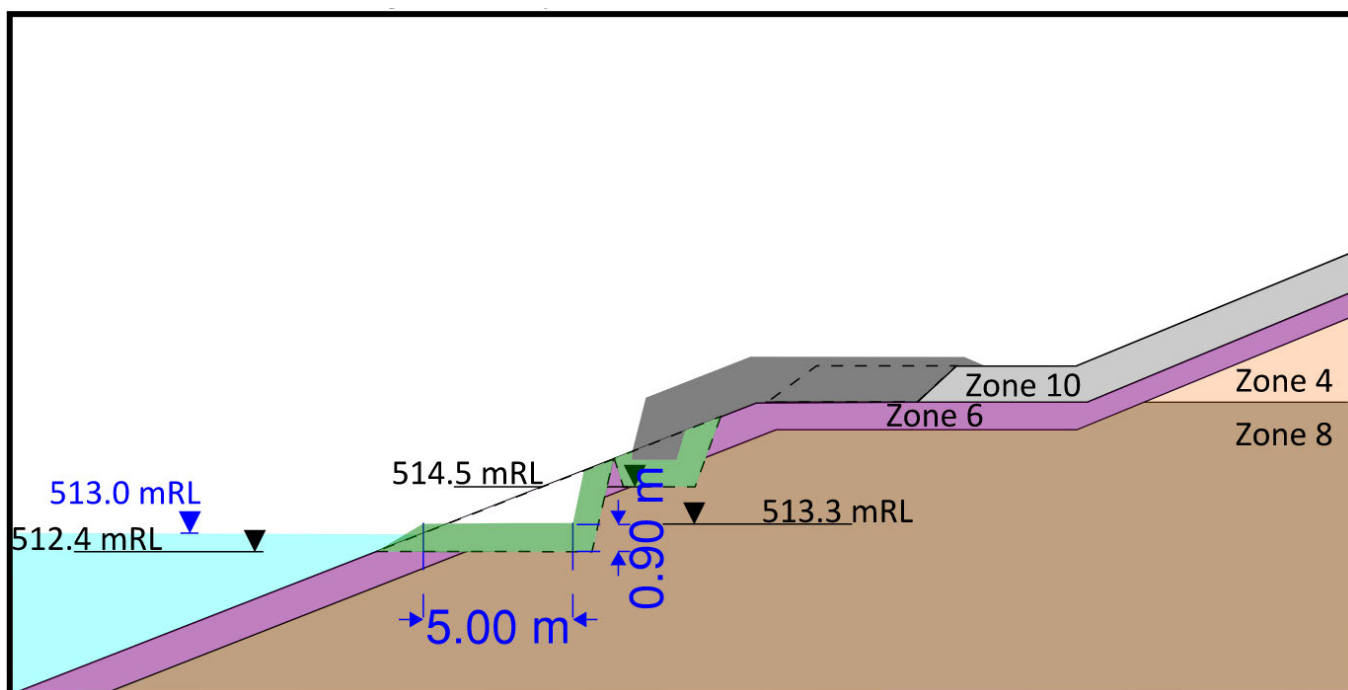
Schematic sketch – Tranche 2 – Main Dam – establishment of construction bench at 512.4 m RL and placement of rip-rap bedding on construction bench and up the cut face – Not to Scale
